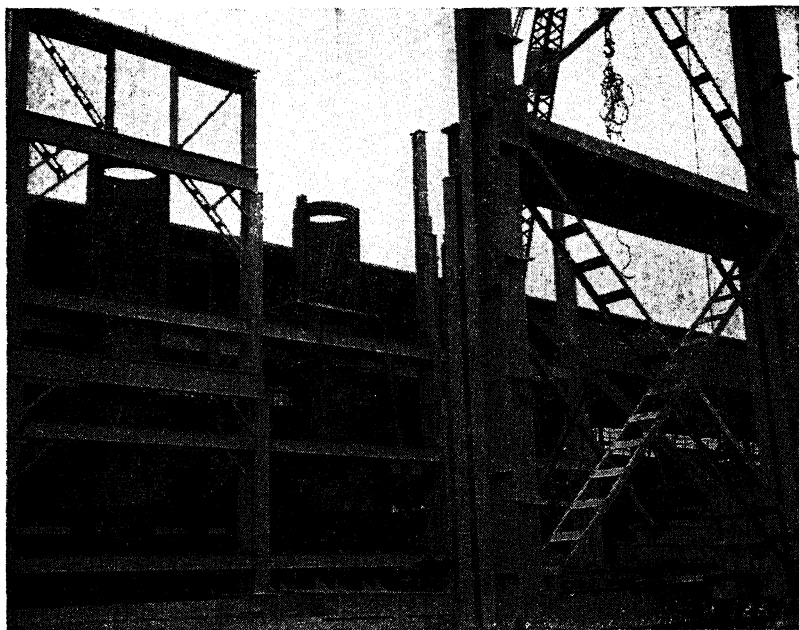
Welded steel columns for new foundry building fabricated from two 18 in. I beams, one 18 in. channel and four channel spaces with stiffeners. Height 70 ft. Will support two cranes at 30 ft. and 60 ft. levels.
